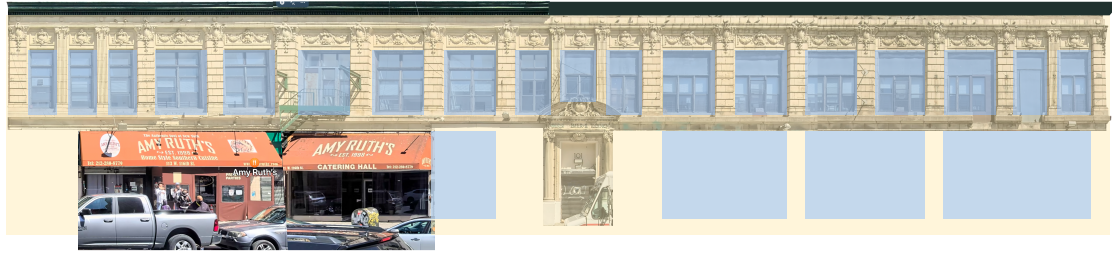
Elevations showing glass storefronts and cornice reinstated in the building's facade.
